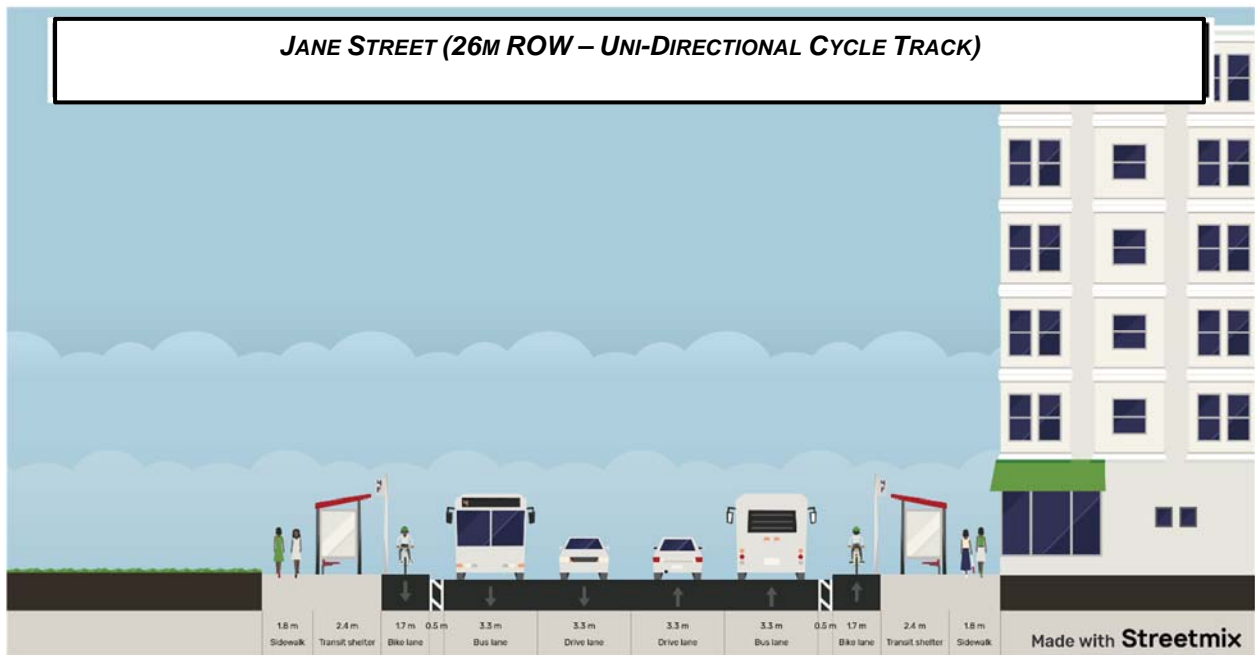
JANE STREET – CONCEPTUAL CROSS-SECTION FOR 26-METER ROW
